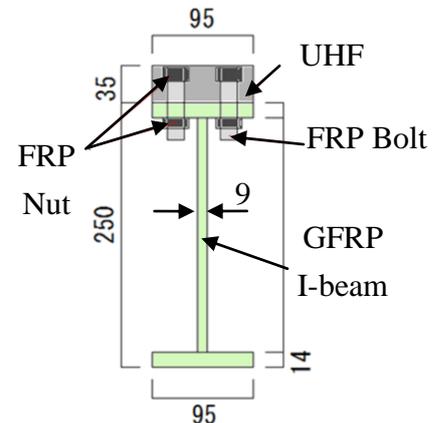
Cross-section of UHF GFRP I-beam (Units in mm)
